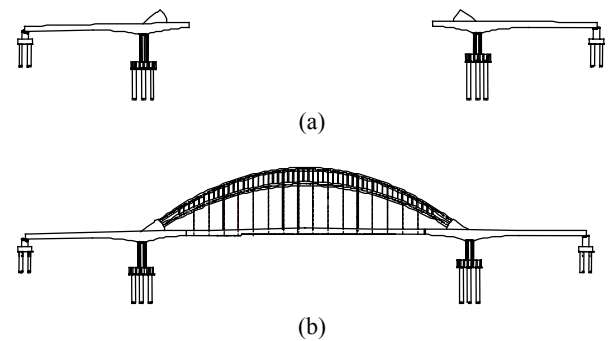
Construction process of Case II. (a) Construct the PC box, girder on frame (first process); (b) Fix the CFST arch ribs, the steel girders, the hangers and the tie-bar (second process)
